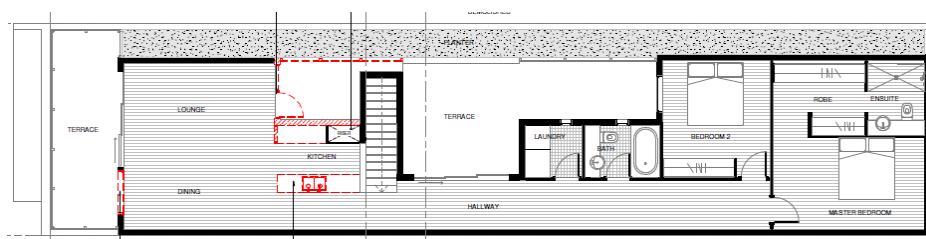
Proposed demolition level 2 plan - 7/274 Arden Street, Coogee (Source: Place Studio)
